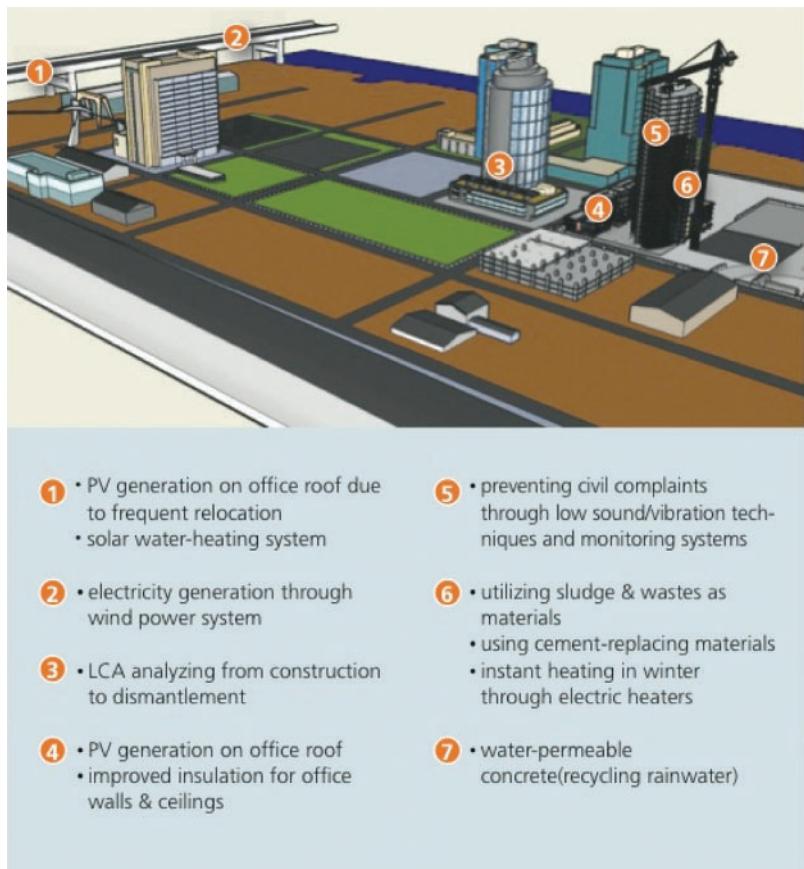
Hyundai E&C's eco-friendly construction site practices
